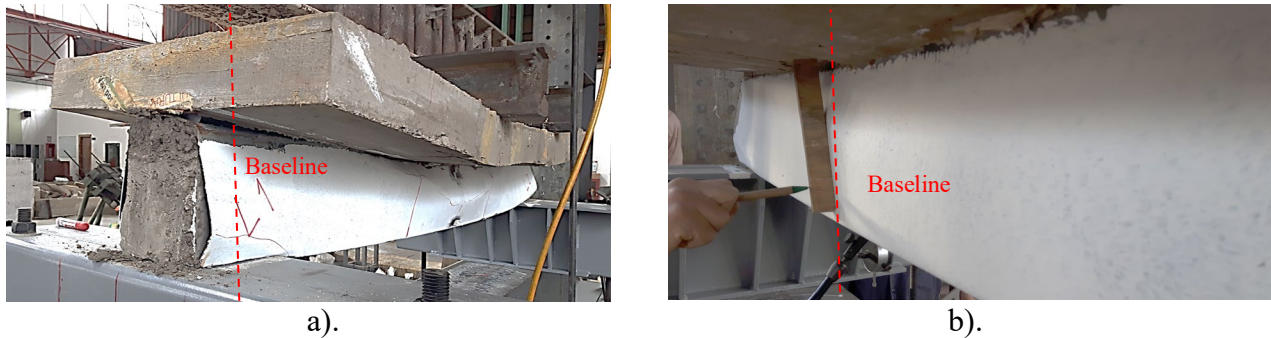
Local buckling in steel shape in full-scale beam test. a). General view. b). Lateral plate detailing.
